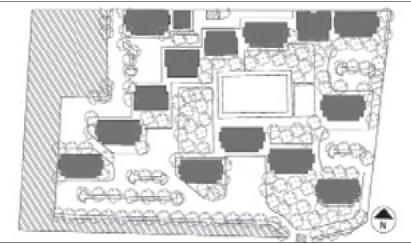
Site plan of Behjatabad residential complex (Behzadfar & Qazizadeh 2010).
